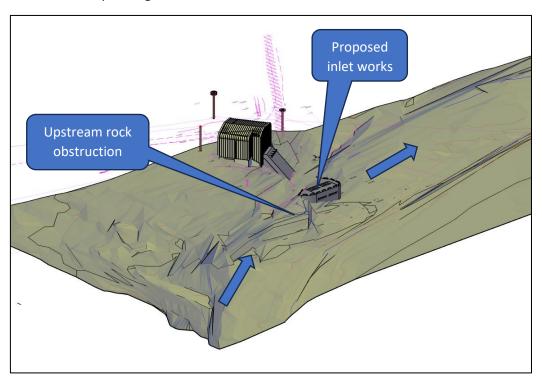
Isometric view looking at the proposed abstraction works from upstream (2025 survey)
